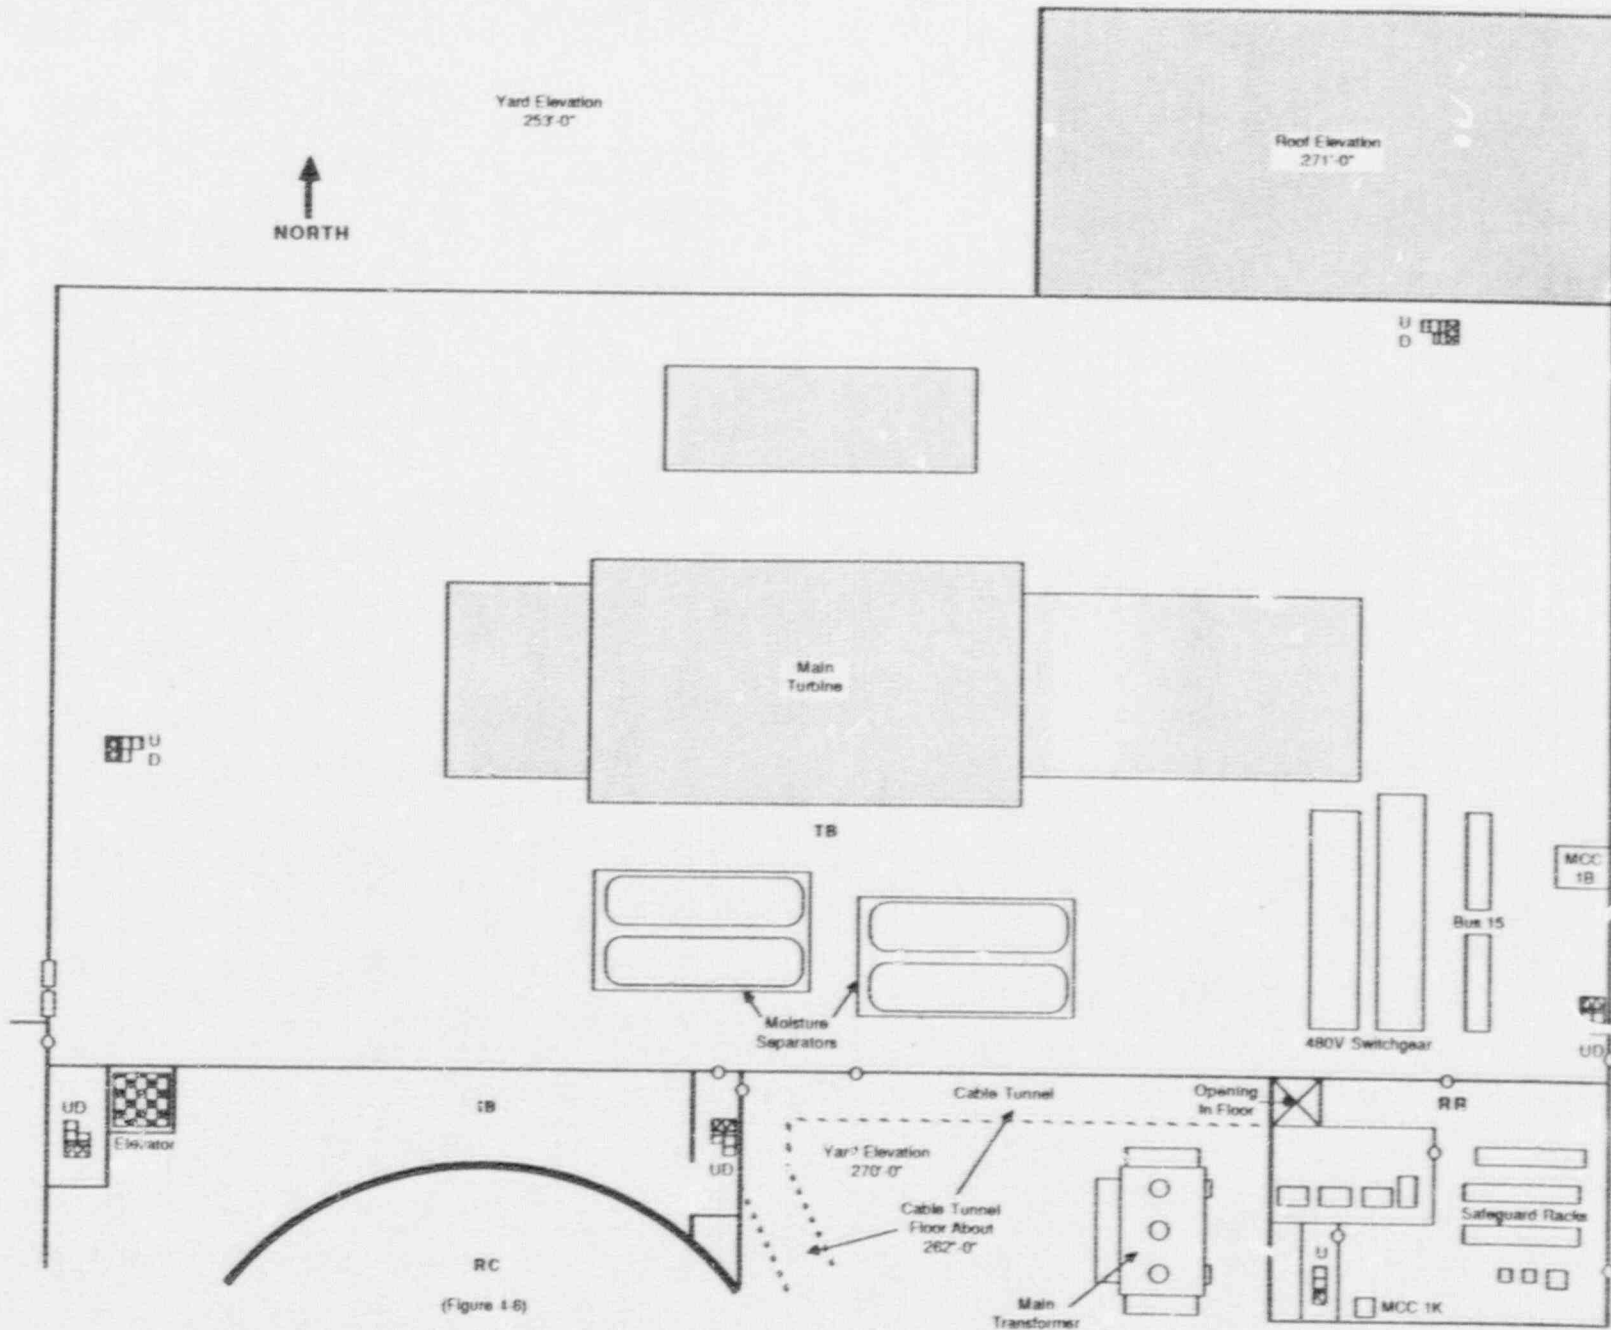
Ginna Turbine Building, Elevation 271'-0"
